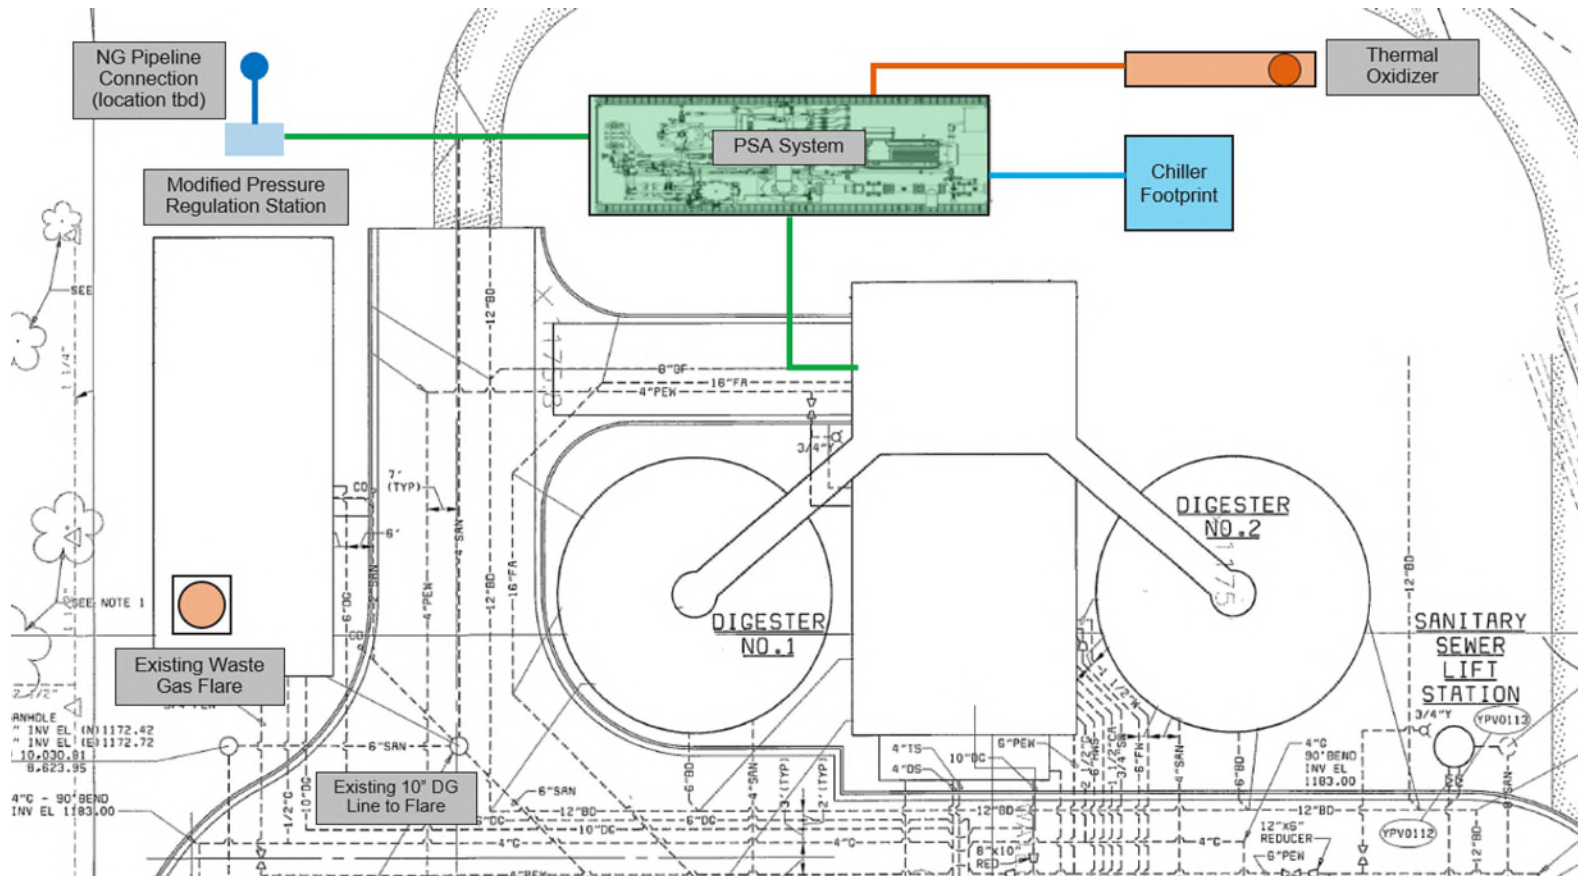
Proposed RNG System Layout Alternative 1: PSA With Thermal Oxidizer
